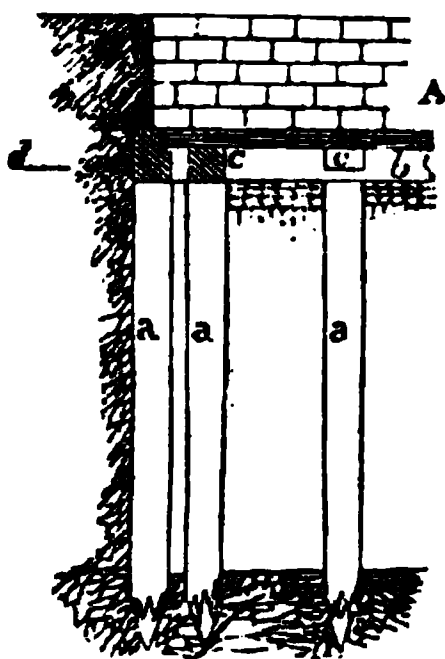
represents the arrangement of a grillage and platform fitted on piles.
